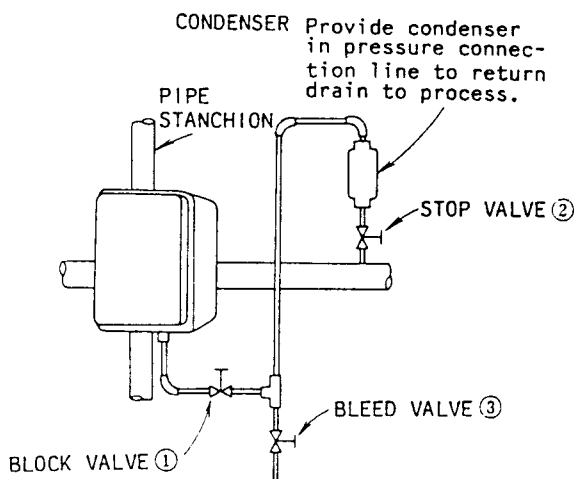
Piping for Wet Gas Pressure Measurement
